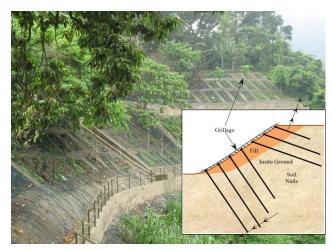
Use of Soil Nails to Stabilize Fill Slopes
